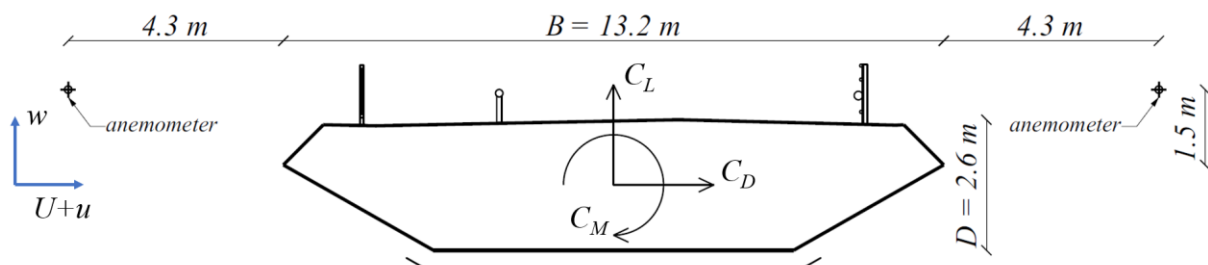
Cross section of the Gjemnessund Bridge box girder.
